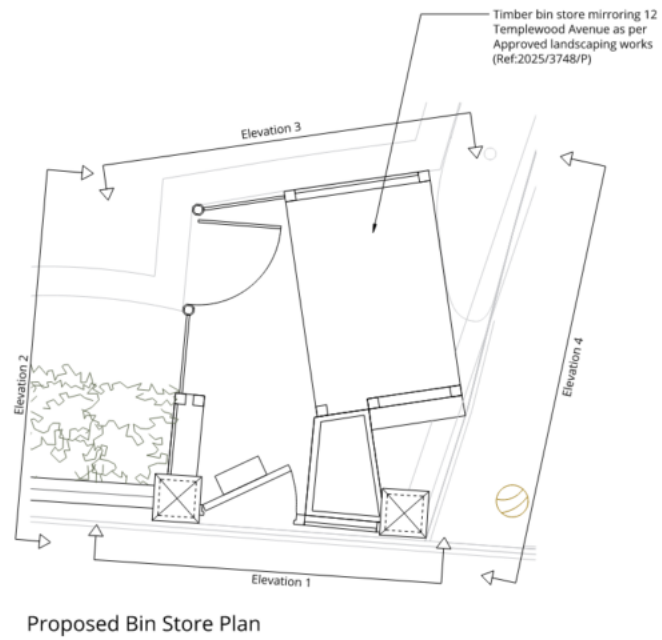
Proposed bin store details including elevation to Templewood Avenue
